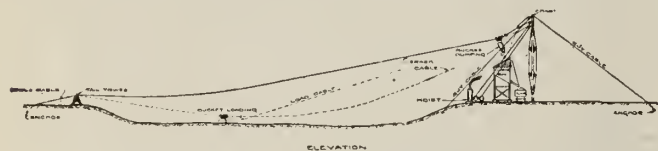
FORWARD DUMP DRAGLINE CABLEWAY EXCAVATOR
